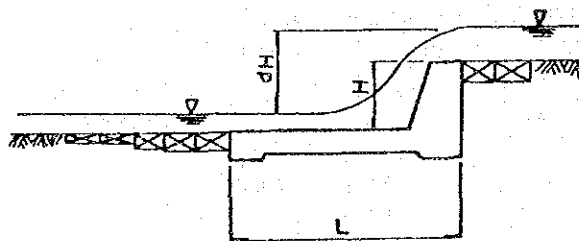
TYPICAL SHAPE OF CONSOLIDATION STRUCTURE
